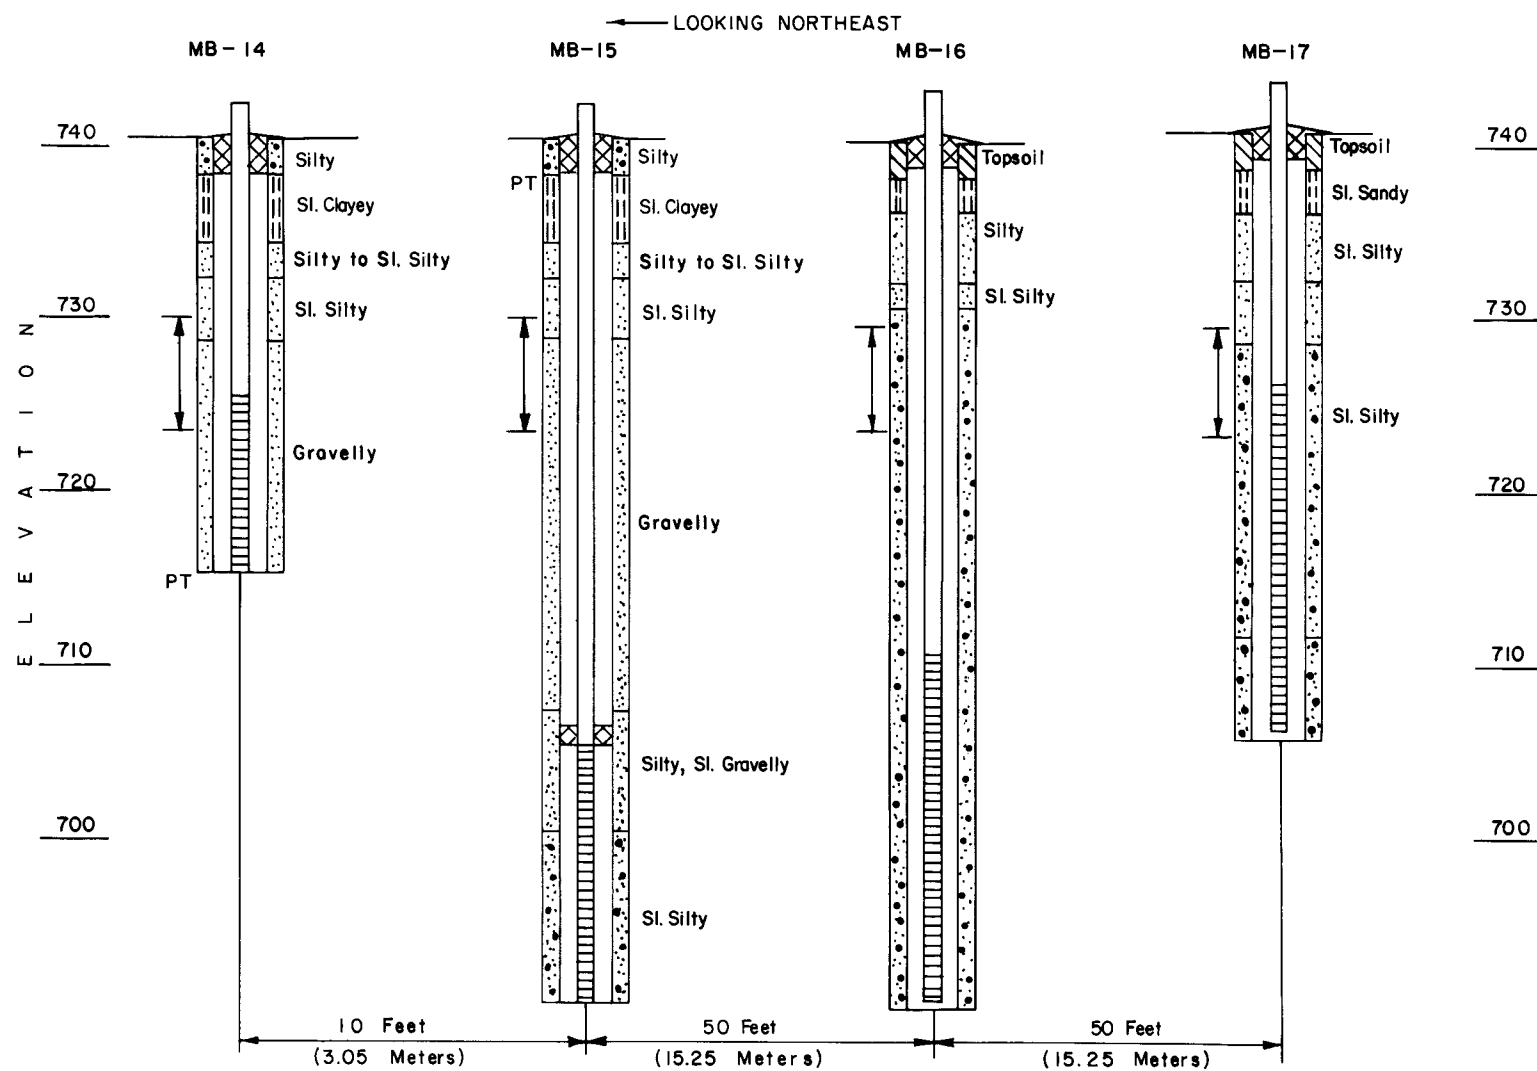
Installation Details - Monitoring Well Cluster MB-14 and MB-15, Observation Wells MB-16 and MB-17
